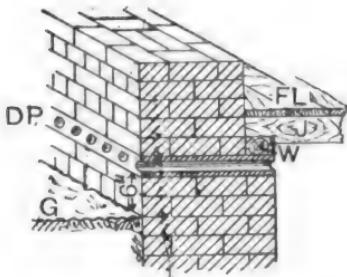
Damp-proof Course when Floor is above Ground Level.
